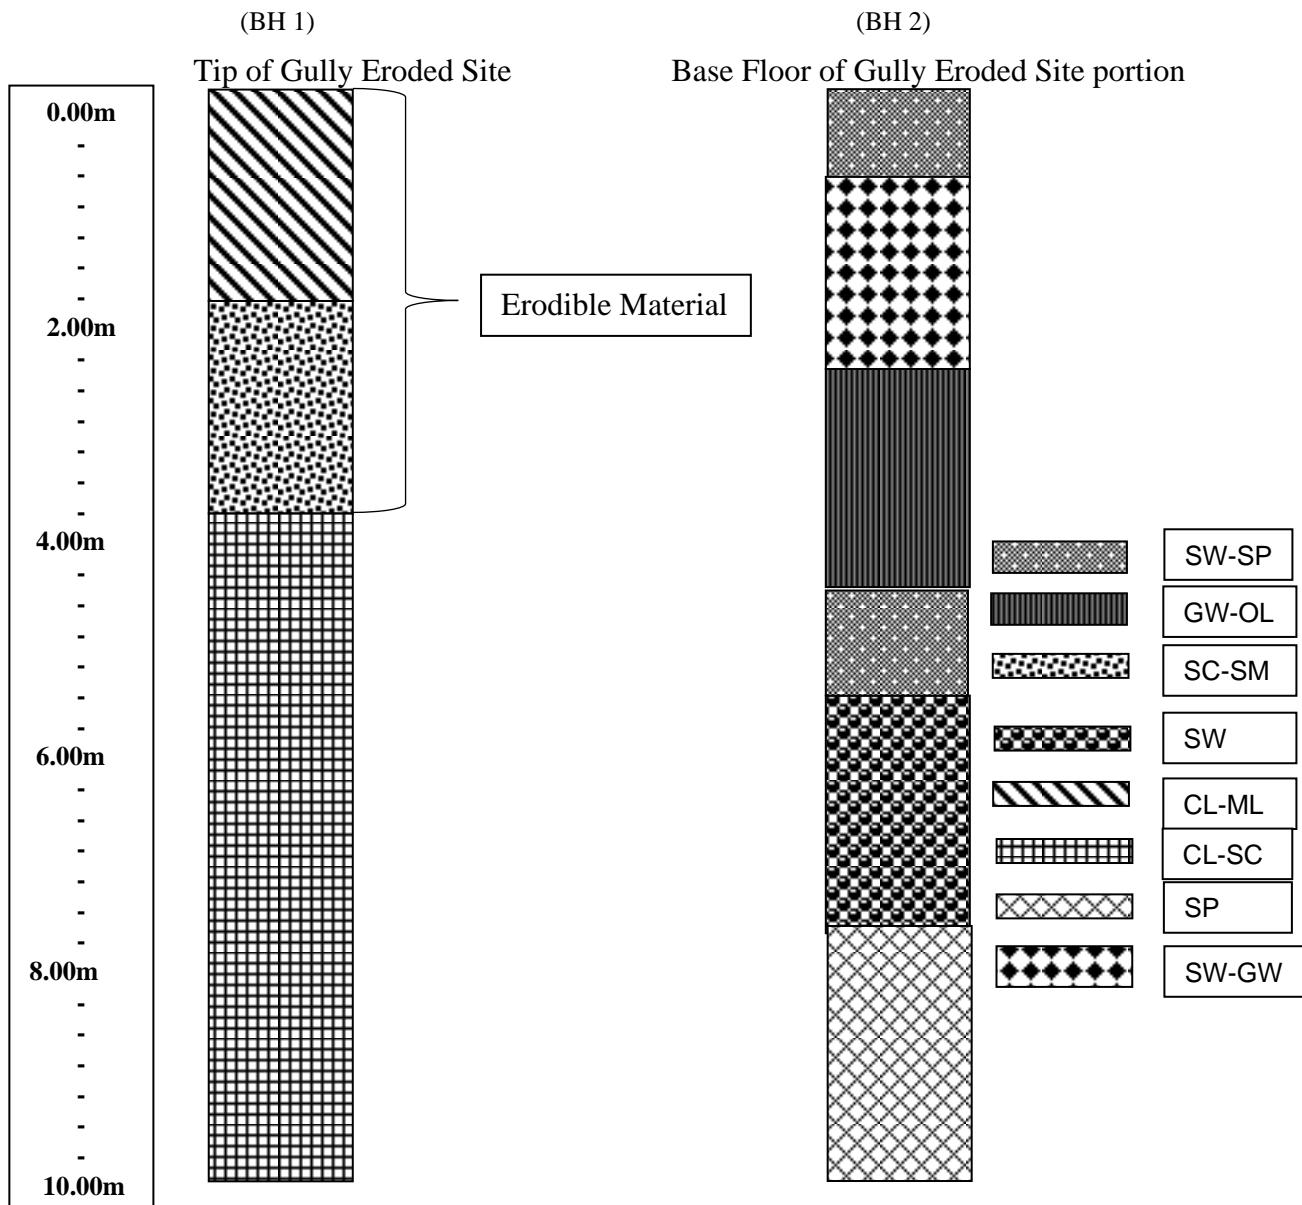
Deep boring log for subsoil profile at tip and base floor of gully, Gorreti site, Ikot Ekpene.
